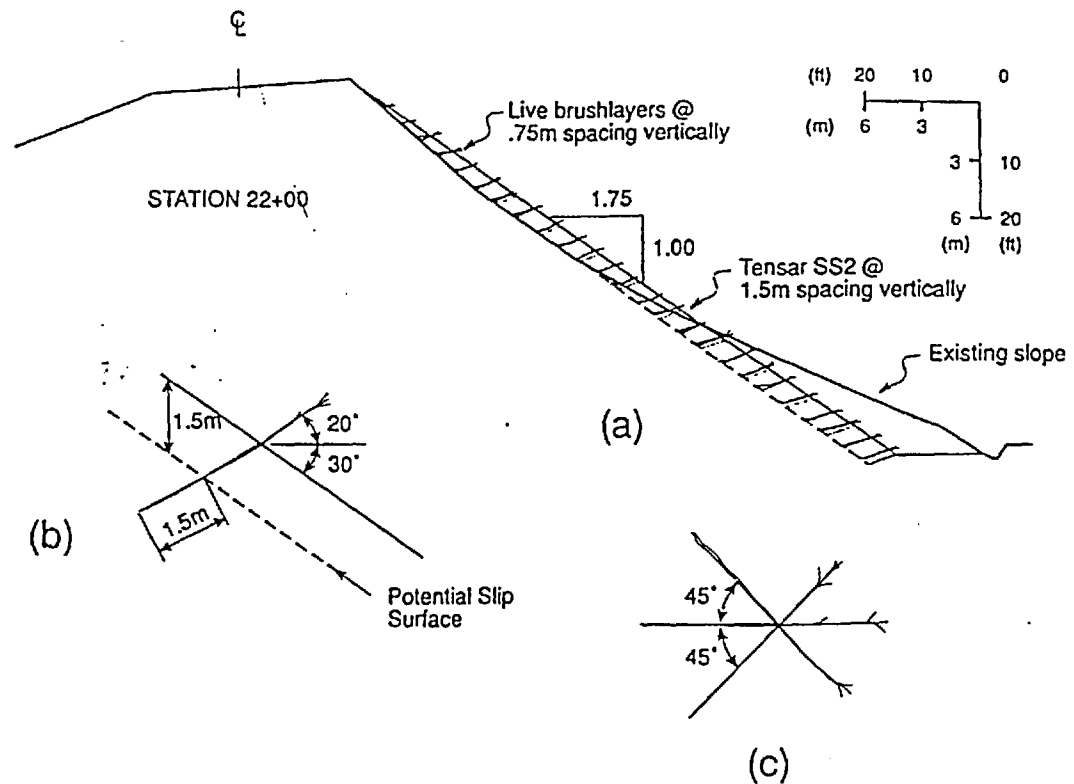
Cross-section of embankment on Route NC126 (from Soil Bioengineering Corp.)
